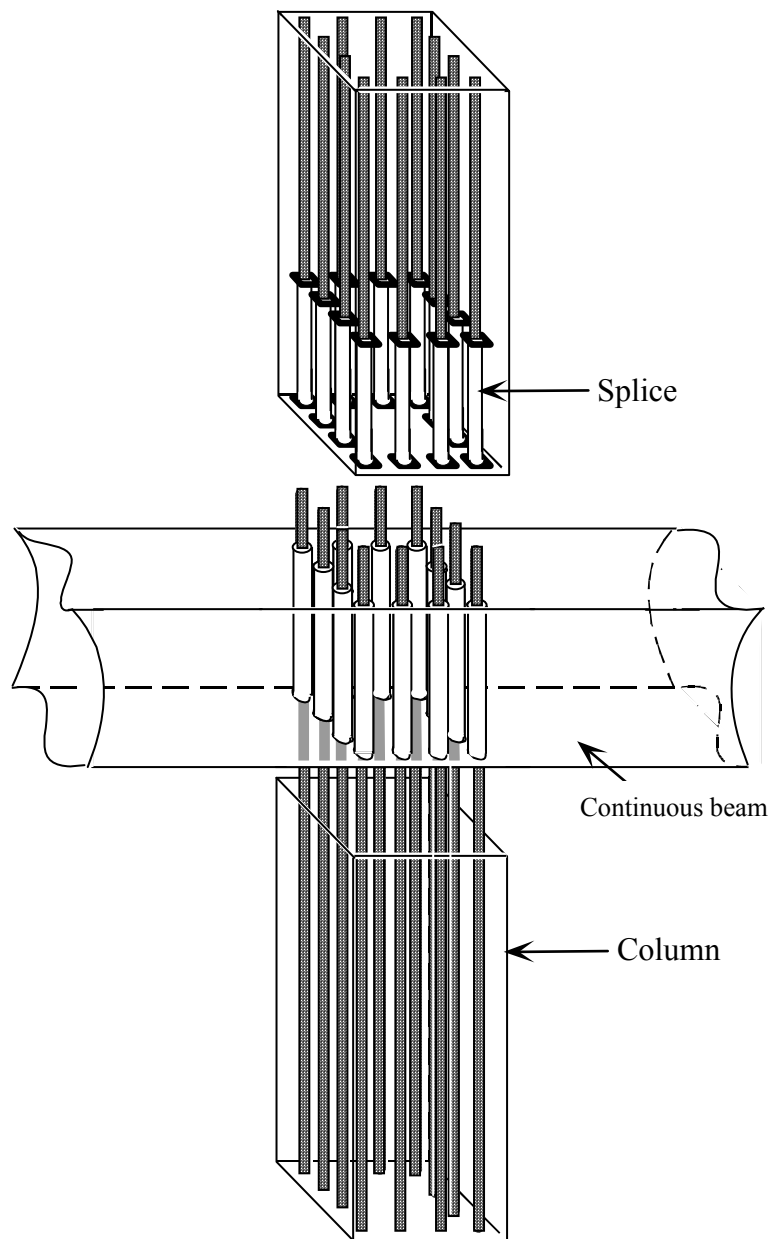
Schematic of Connection Concept and Connecting Elements
